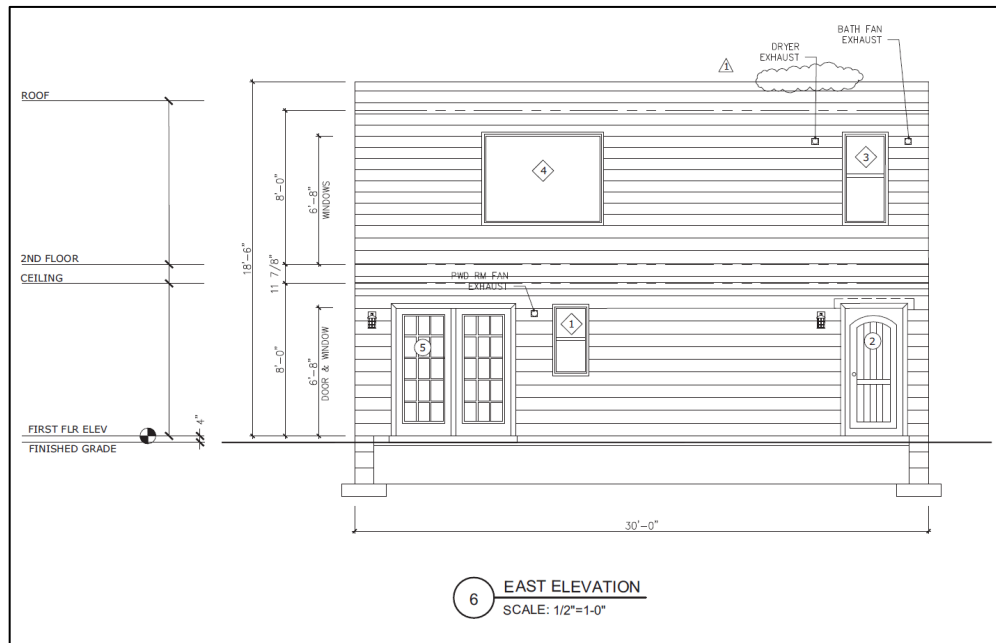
East elevation of proposed garage along the north-south alley abutting the Property.
